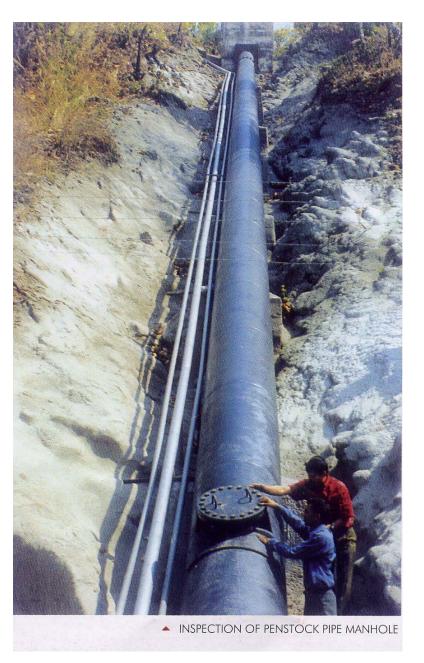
Penstock of Puwa Khola HPS showing Manhole (source: NHE)
